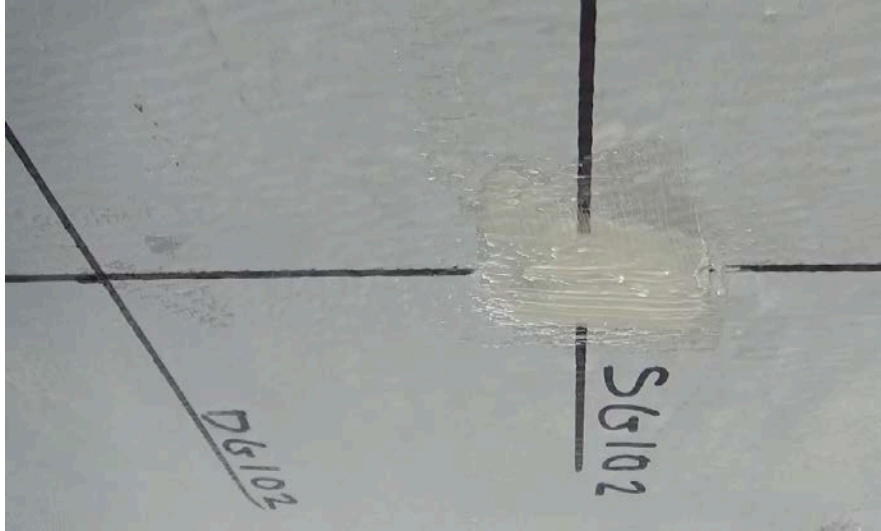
Patch on beam where strain gage SG102 was placed for load test
